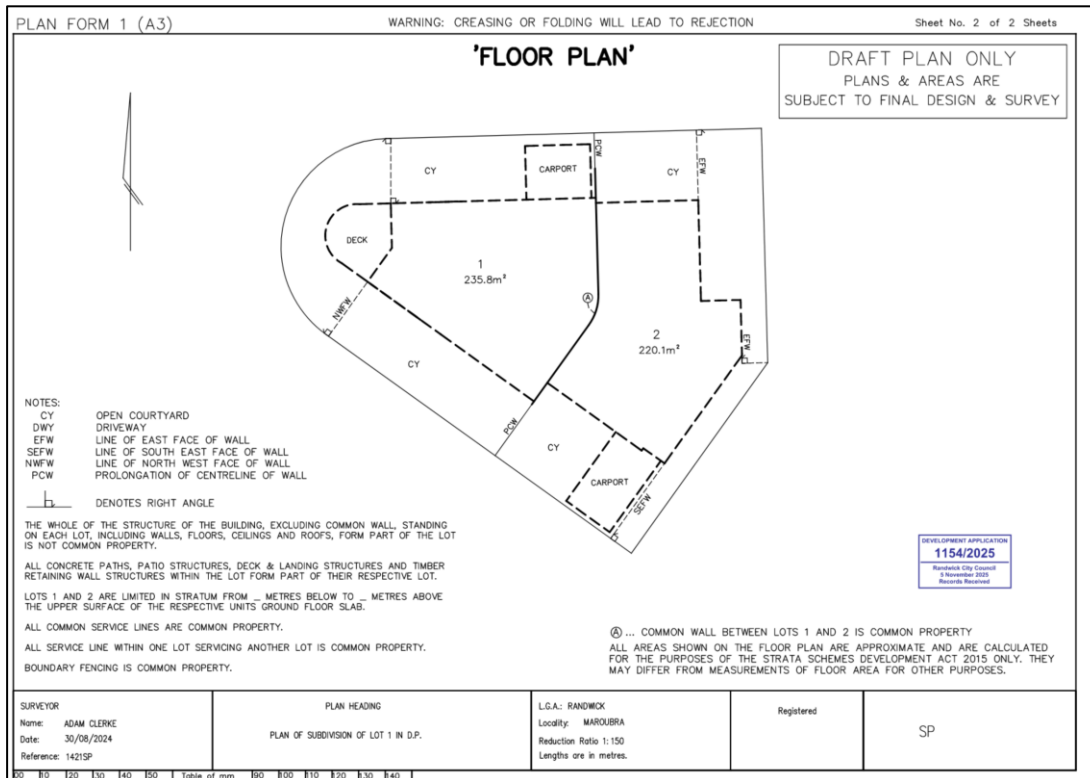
Proposed Subdivision Plan (Source: Applicant)
